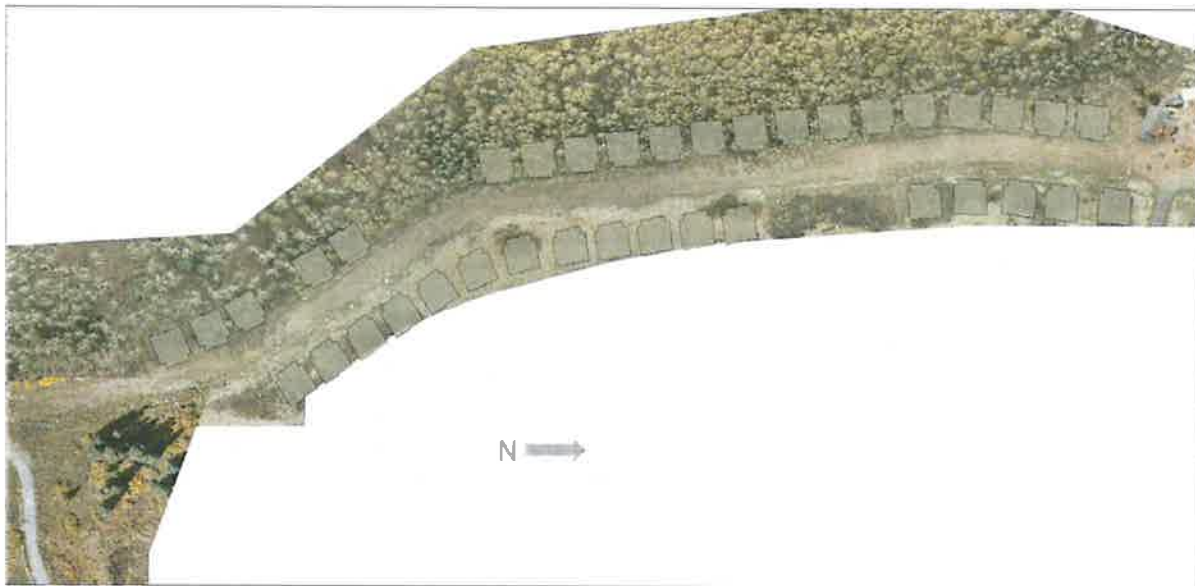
Conceptual Site Plan prepared by CHC Engineers, LLC.
